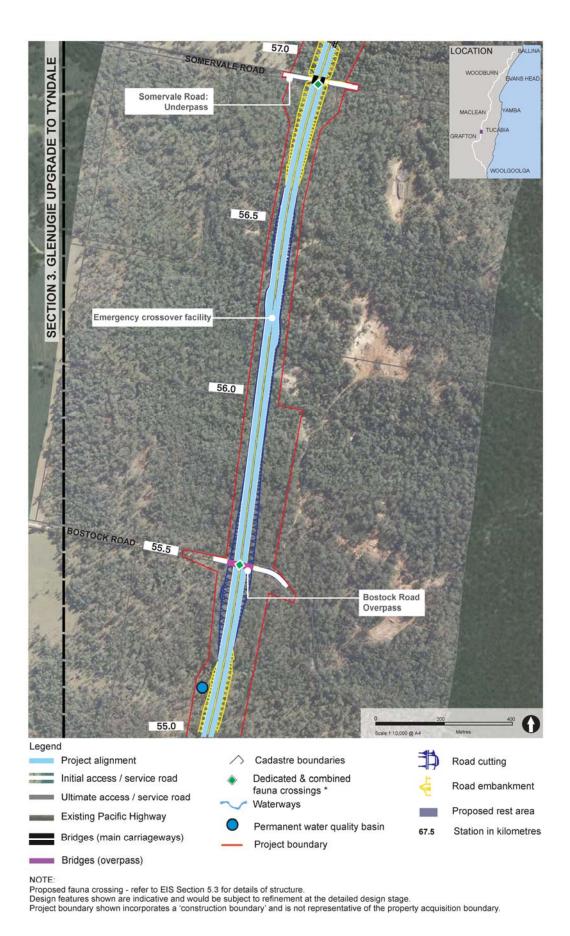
The project - Section 3 (Station 55.0 to 57.0)
